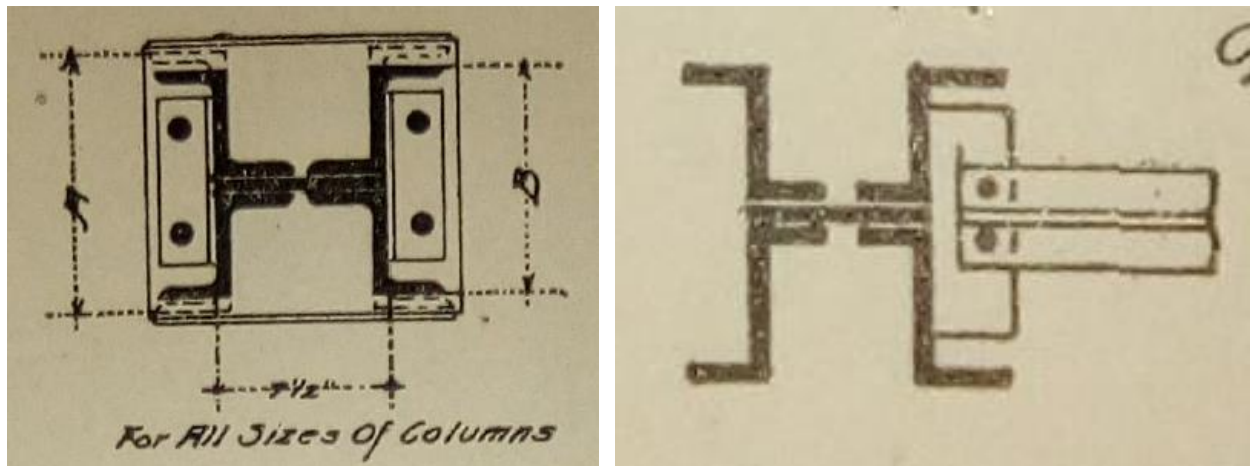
Typical beam-column section (Original building drawing provided by KPFF)
